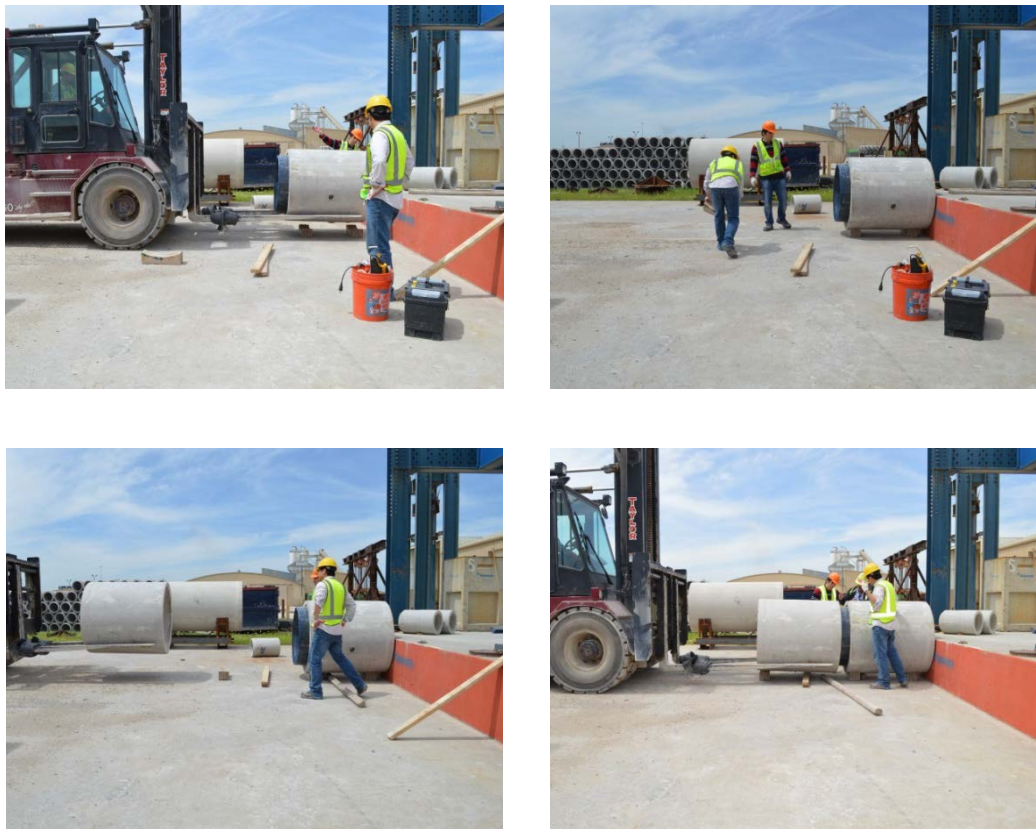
Assembling concrete pipes with the CFRP coupler
